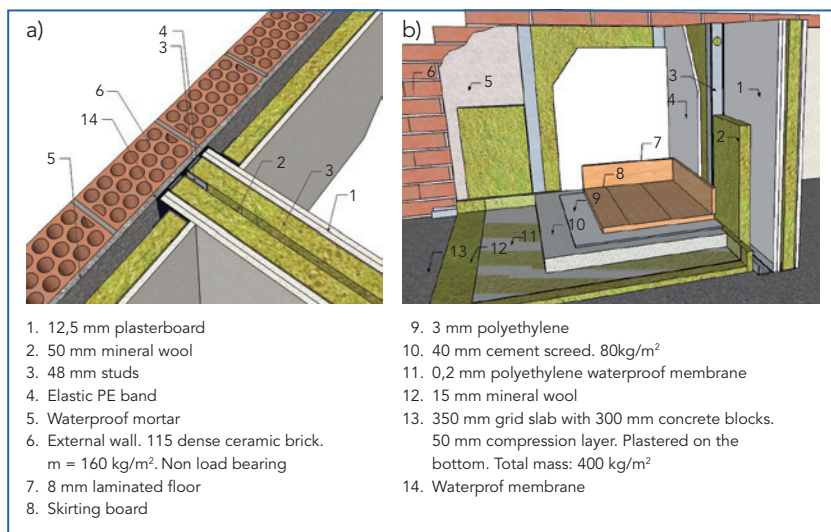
Example of Type 3 separating wall. a) Plan view of junction between separating wall and façade. b) Junction with floor.
